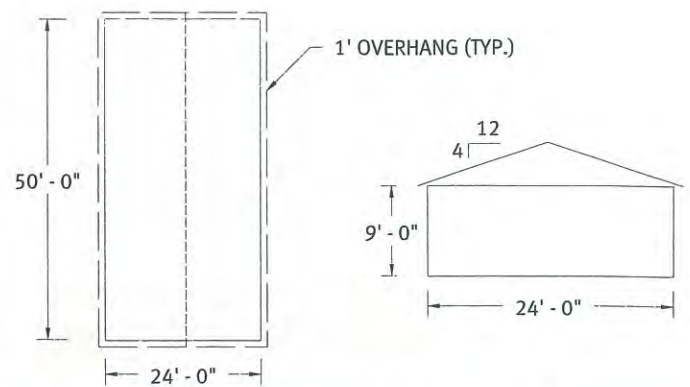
Plan and elevation views of ICF house used in the design example (1 ft = 0.305 m)
